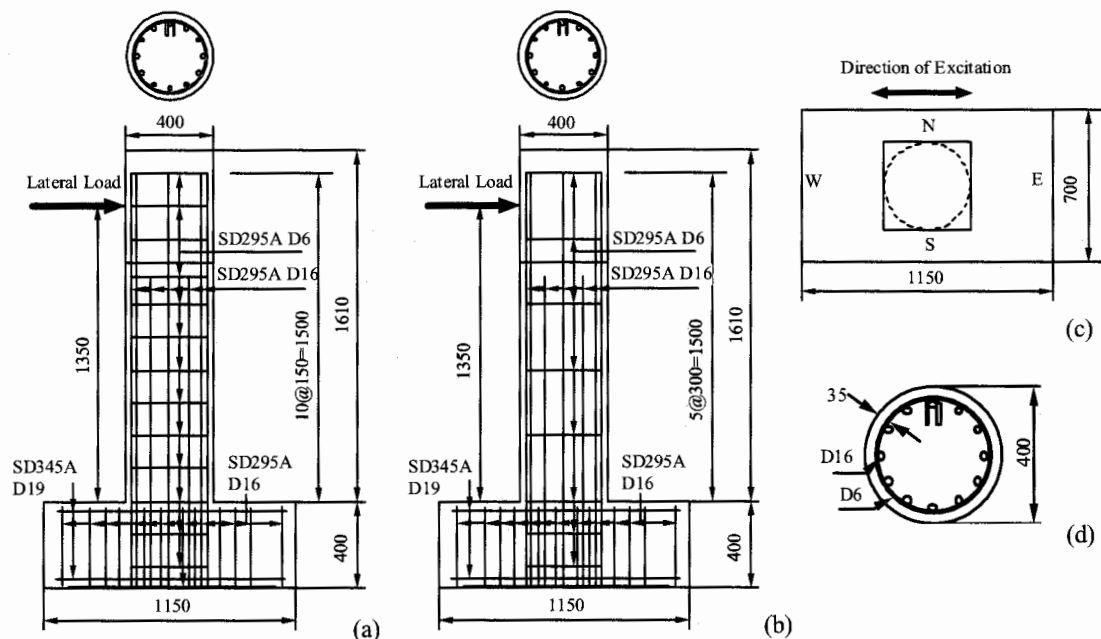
Column Specimens for Cyclic Loading Test: (a) A1~A3 Specimen, (b) B1~B3 Specimen, (c) Top View, and (d) Section
